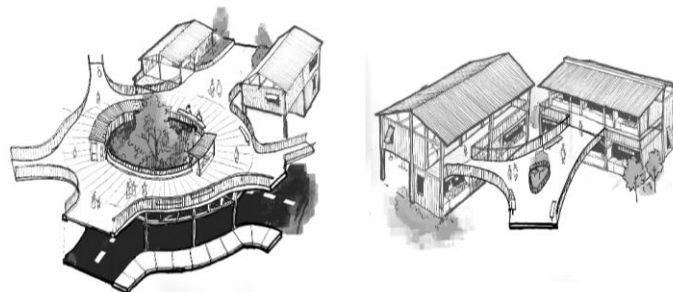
Proposed Eco Market Node and Elevated Walkway (Source: Authors)
